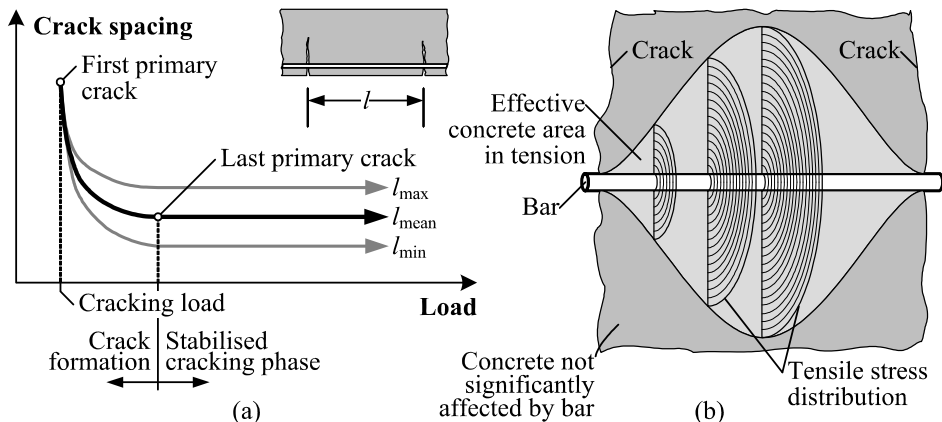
Flexural cracking (Borosnyói & Balázs 2005): crack formation and crack spacing (a); conception of effective concrete area in tension (b)
